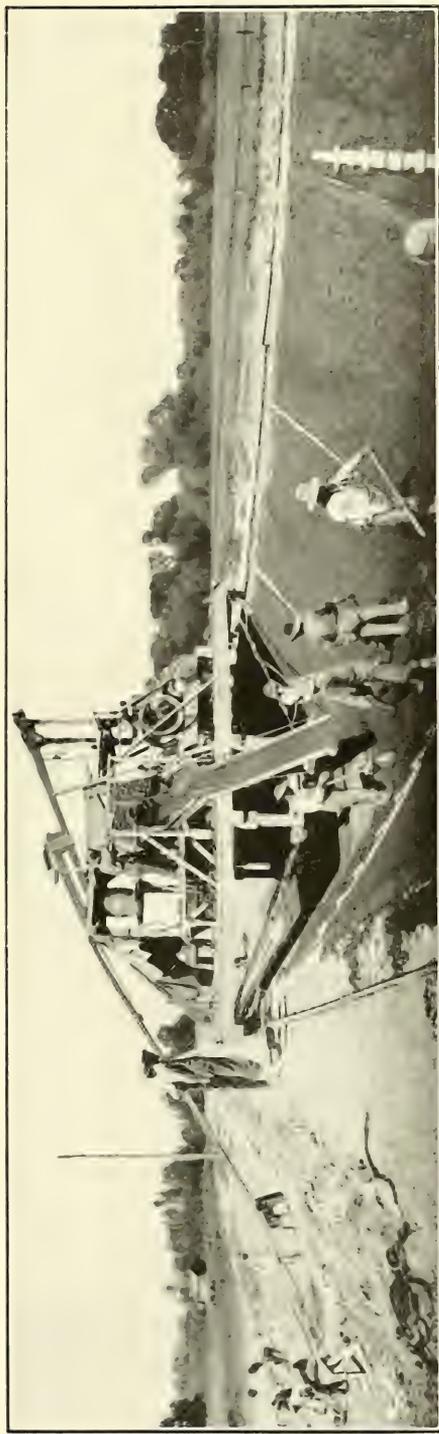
CONSTRUCTING CONCRETE LINING IN MAIN CANAL, PATTERSON LAND & WATER CO., PATTERSON, CAL.
